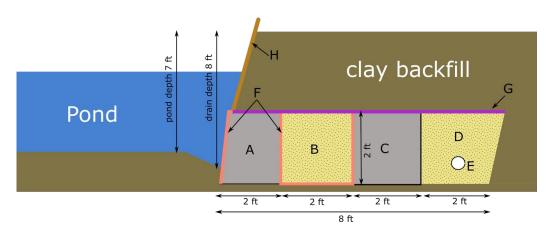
Schematization AgriMAR system – cross sectional view and dimensions of the drain intake
